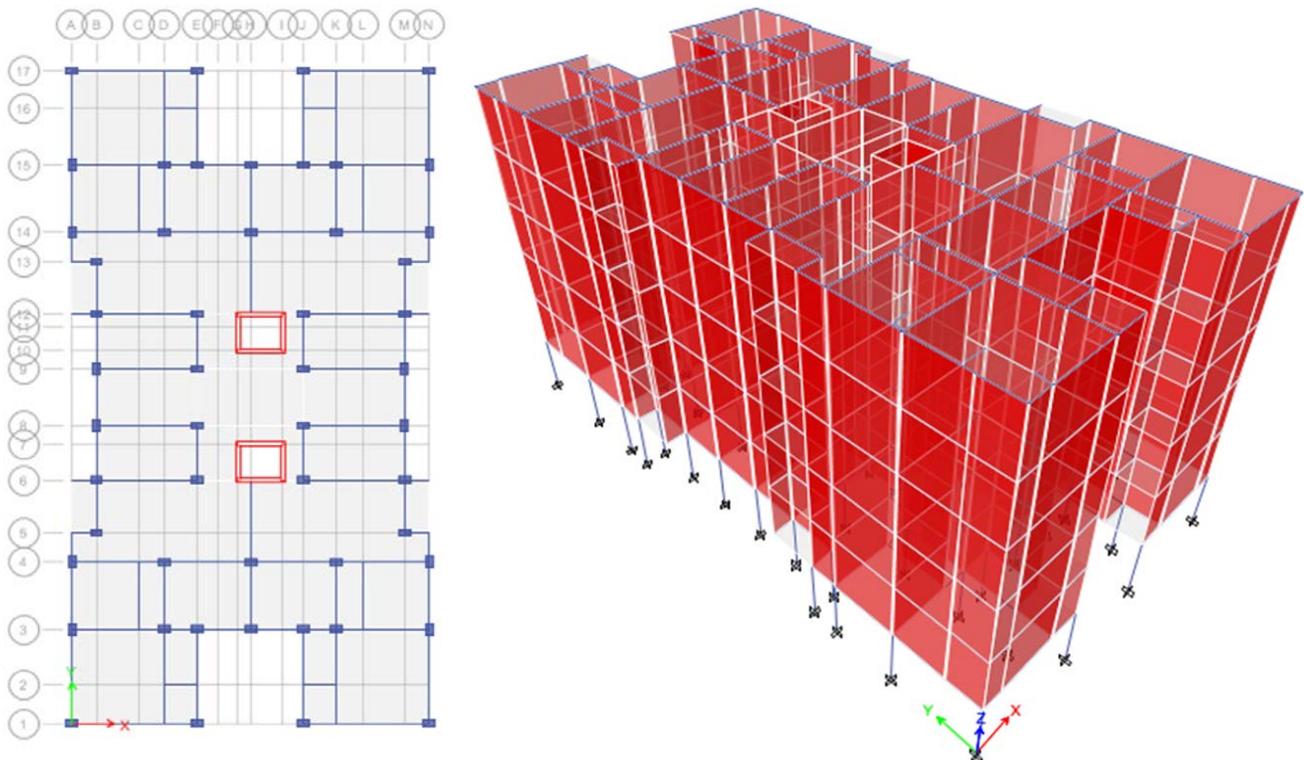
GFRG OGS building modelled in Finite Element Software
